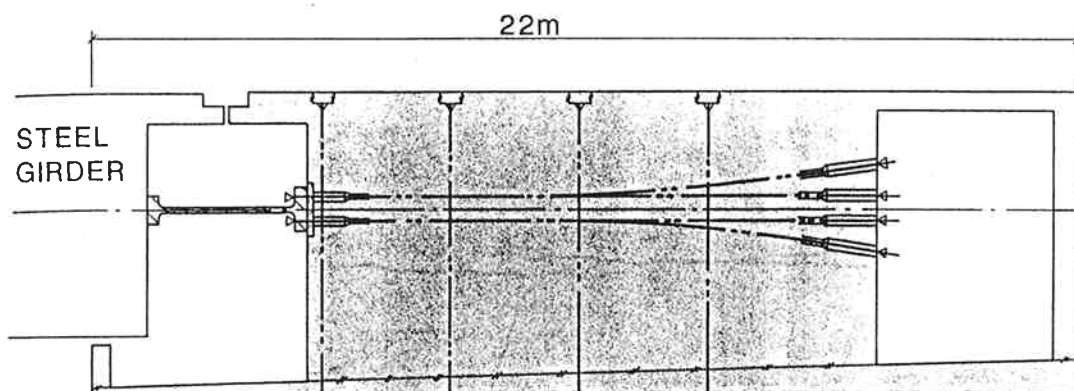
Arrangement for fixing of the floating bridge to the abutment
